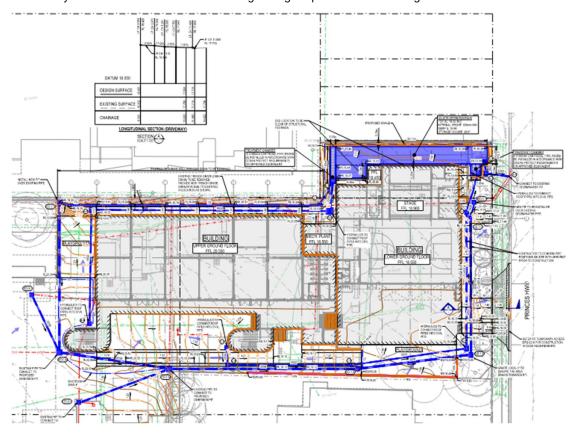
Site Stormwater Layout (Source: Meinhardt Stormwater Layout Plan)
